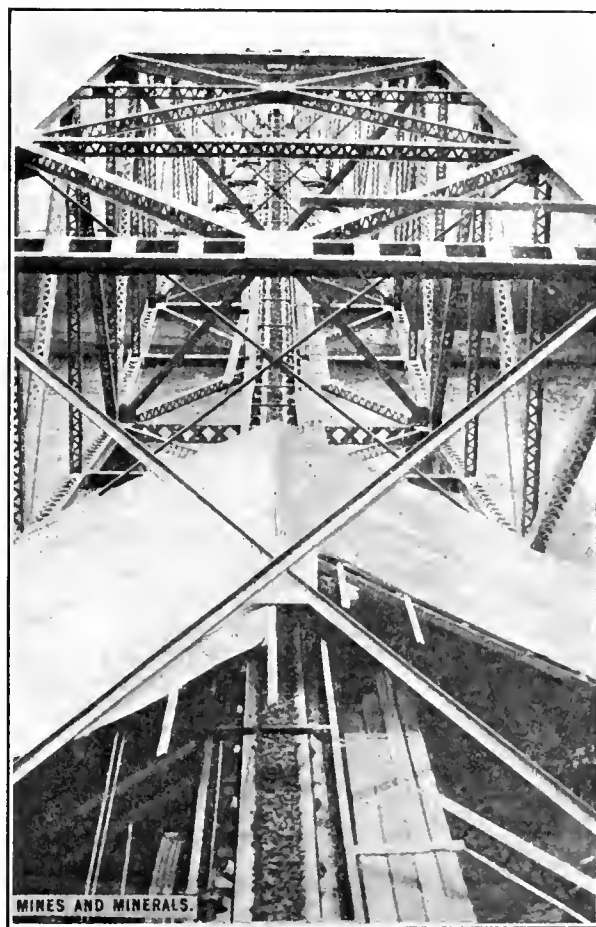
CANTILEVER AND ENDLESS BELT FOR LOADING ORE
